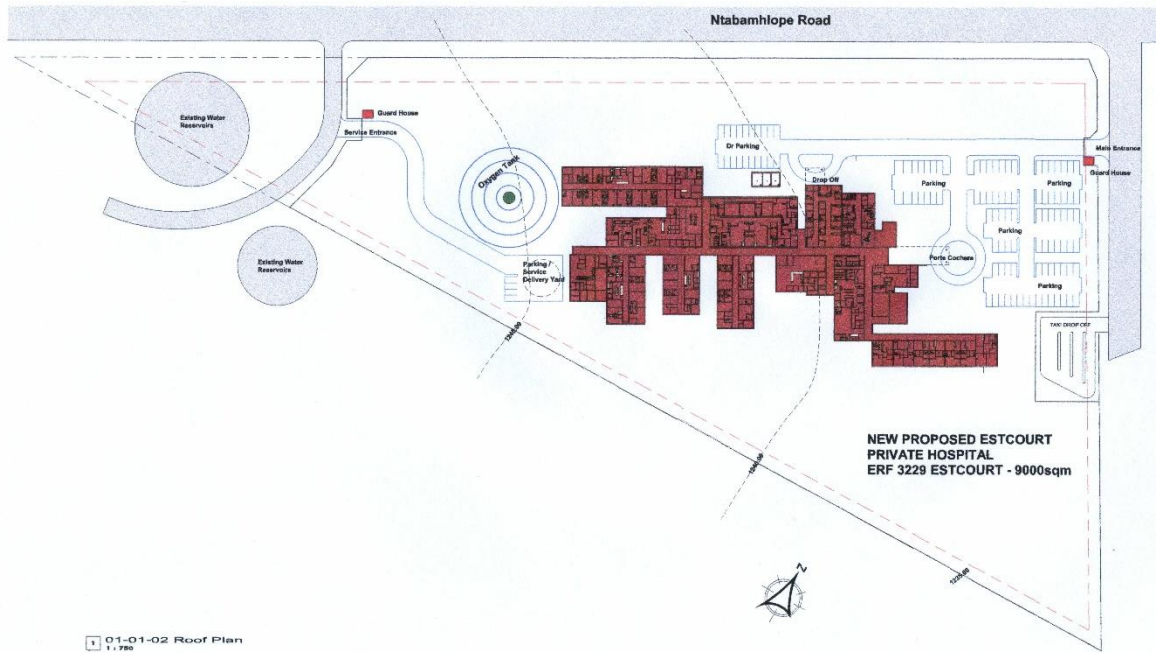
Site plan for the proposed Private Hospital on Erf 3229, Estcourt, KwaZulu Natal.
